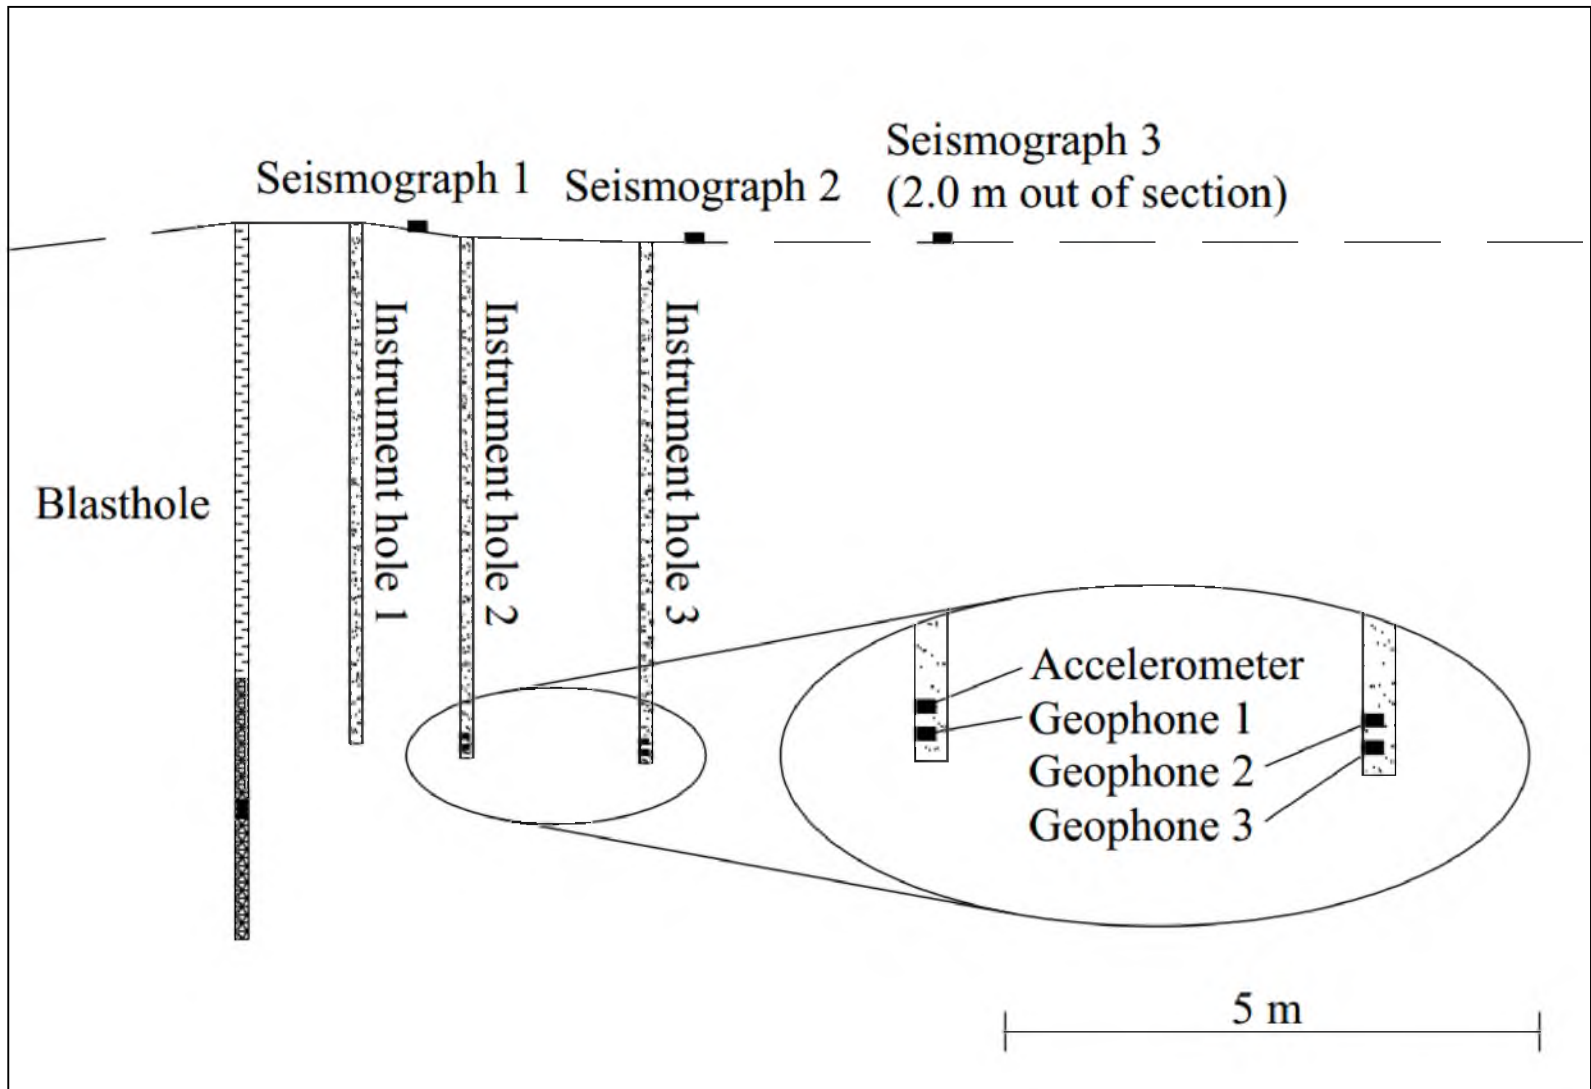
Section view layout of blasthole, observation holes, and seismographs
